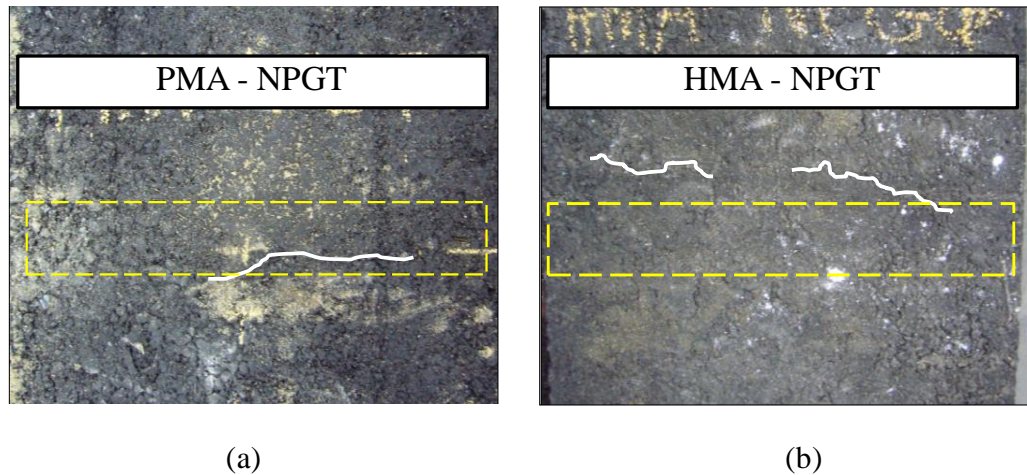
Surface cracking in new reinforced with geocomposite pavements: (a) PMA pavement; and (b) HMA pavement
